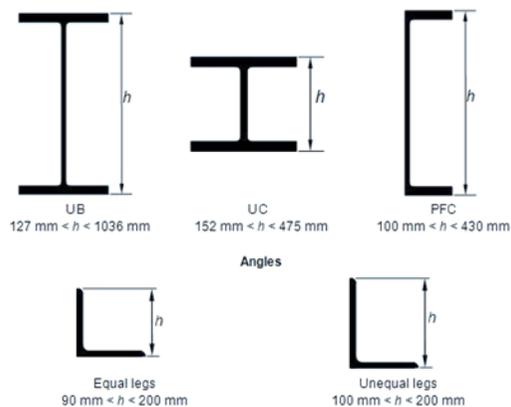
UK Hot – Rolled Steel Open Sections [191]
